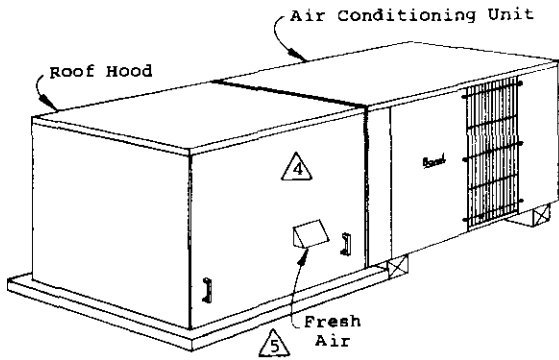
TYPICAL ROOFTOP INSTALLATION
